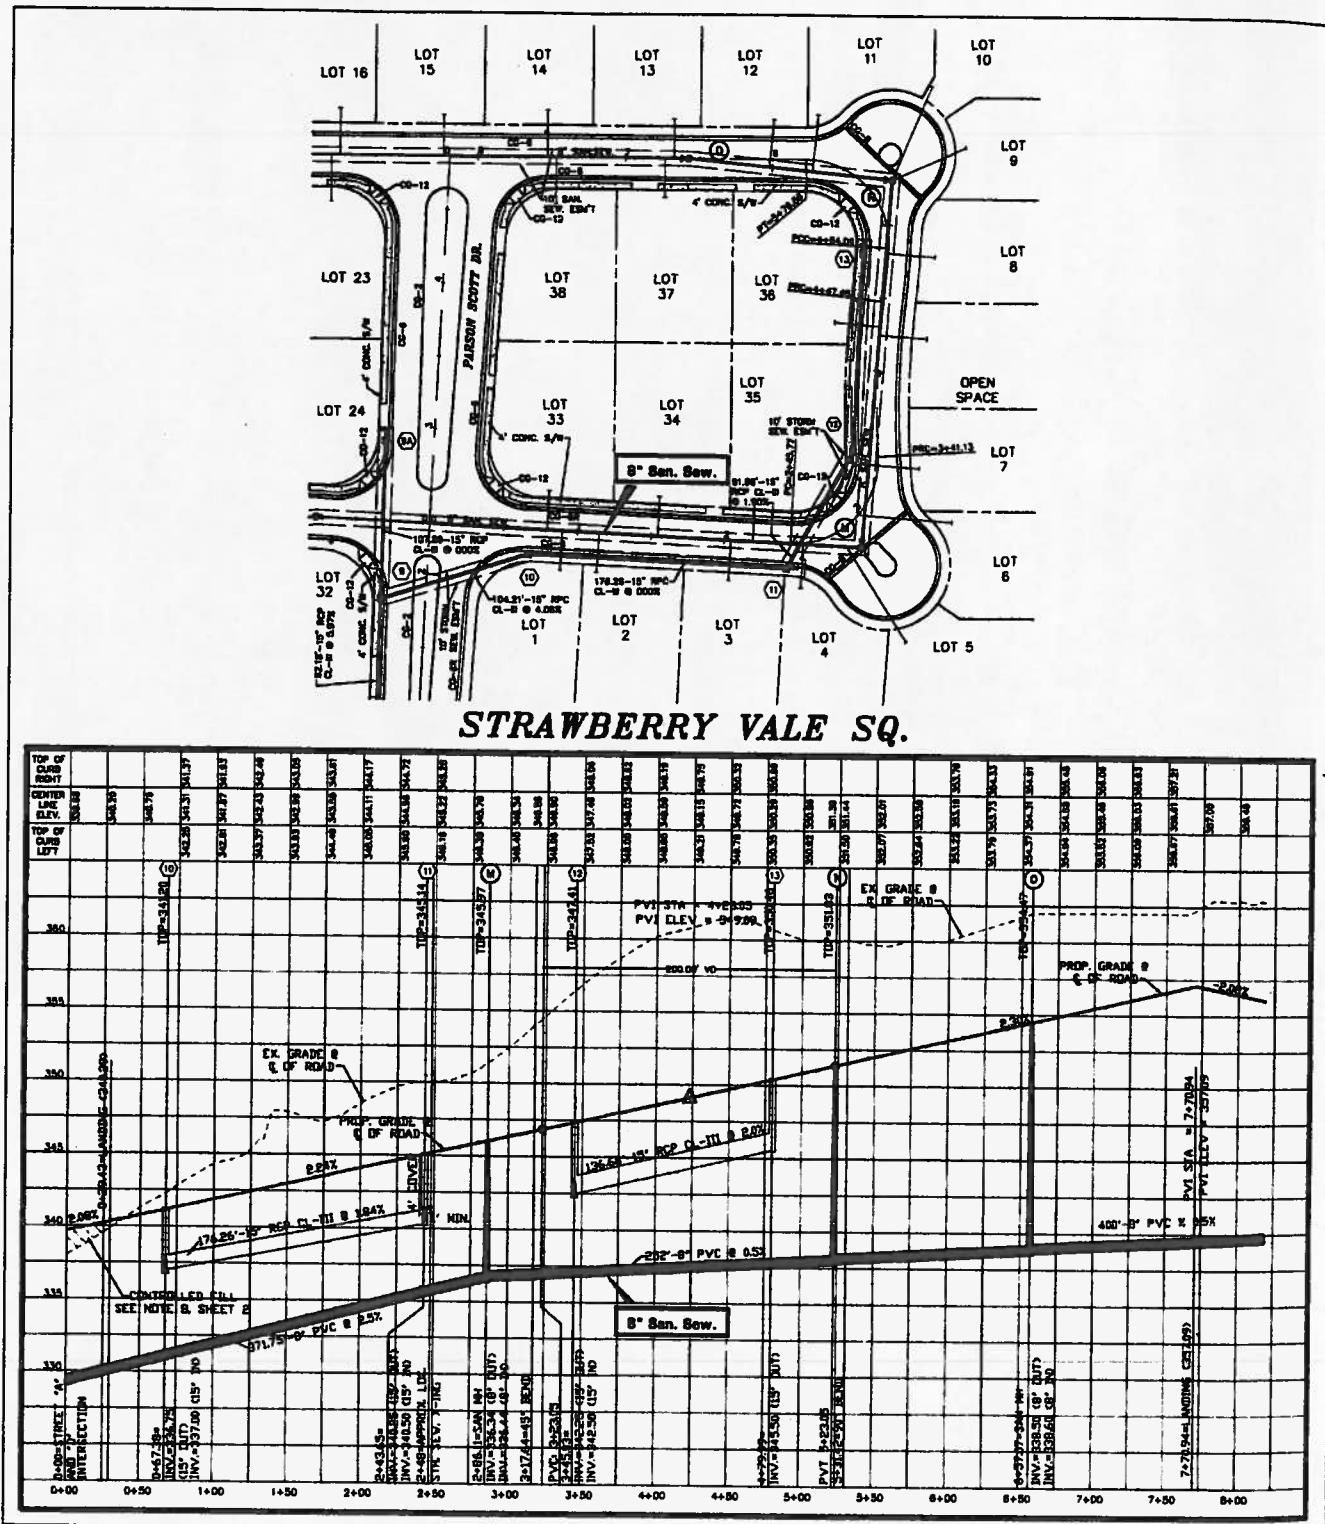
Example of a plan and profile view for a sanitary sewer line.
